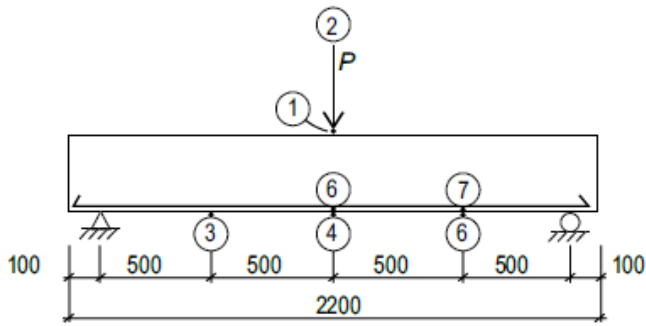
Test set-up for fatigue loading of concrete beams with shotcrete overlay.¹⁰ The encircled numbers 1 through 7 indicate measuring points (Note: 1 mm = 0.04 in.)
